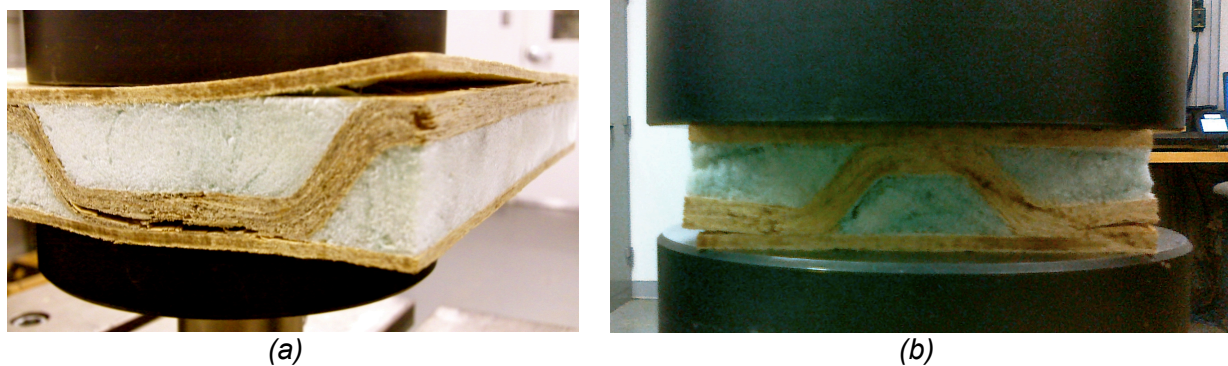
(a) Delamination failure in 215 mm x 215 mm specimen at wood-strand failure prior to stiffening caused by foam. (b) Delamination failure in 108 mm x 108 mm specimen at wood-strand failure.
